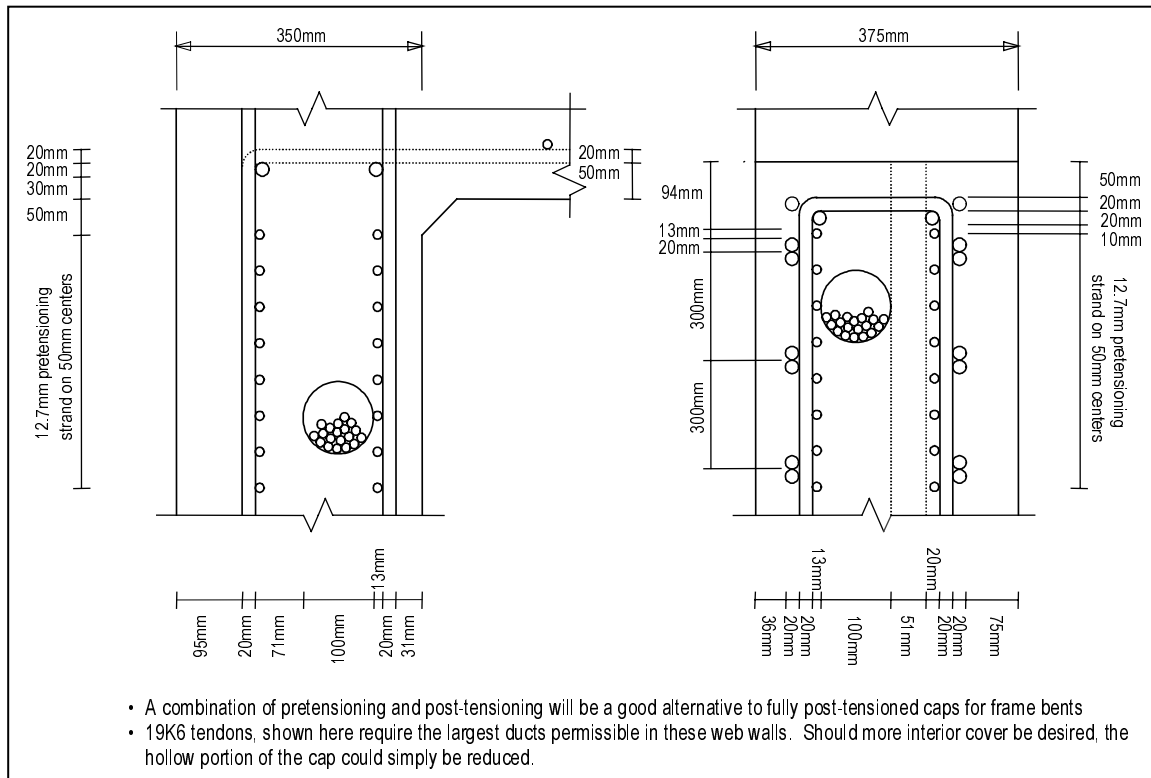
Spacing and cover details for a cap with pretensioned and post-tensioned longitudinal reinforcement
